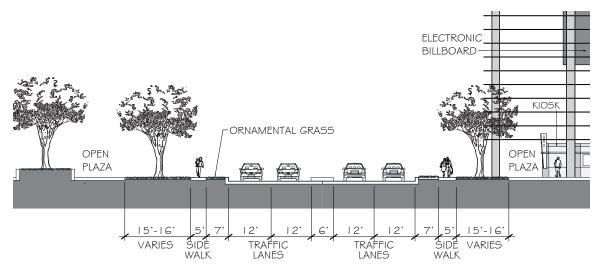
Shared Drive Between SA 18 & 19 (South of Toyota Arena) Private Streetscape Section and Plan
